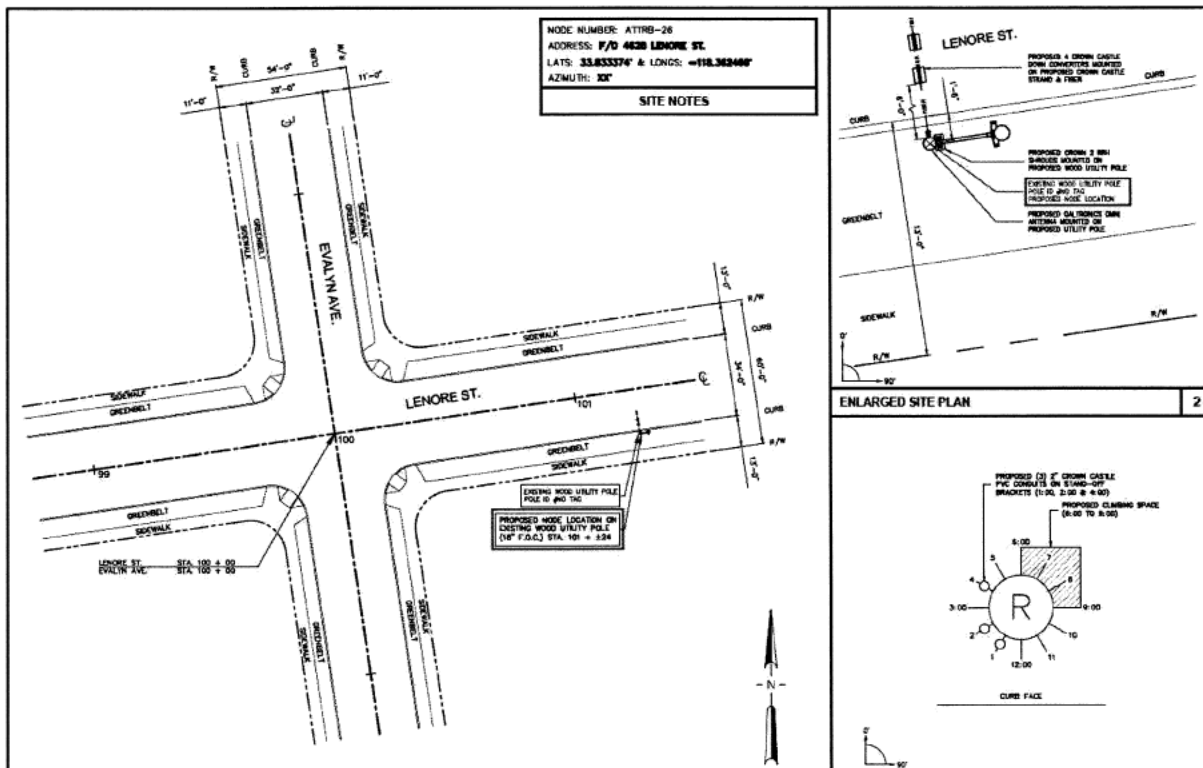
No replacement Pole proposed (Source: Plans A-1 Panels 1 and 2, annotated by Dr. J. Kramer).
